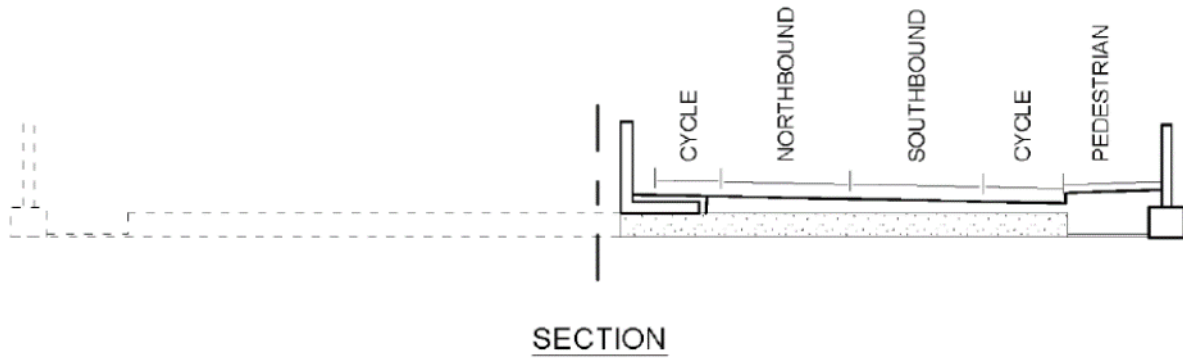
Step 3: construct new northbound bridge, move traffic onto it and demolish existing southbound bridge
